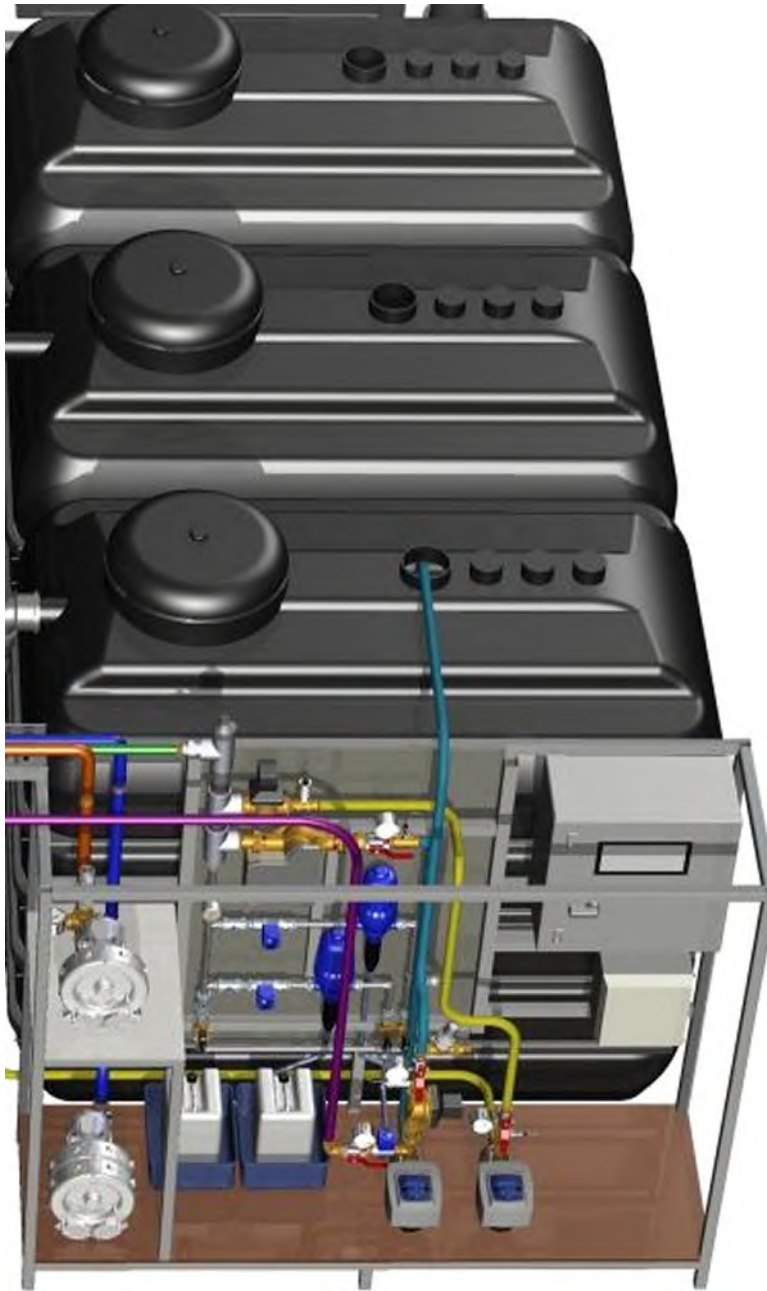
Overview Clear Water Tanks for AL-GW 32400 and technical unit
